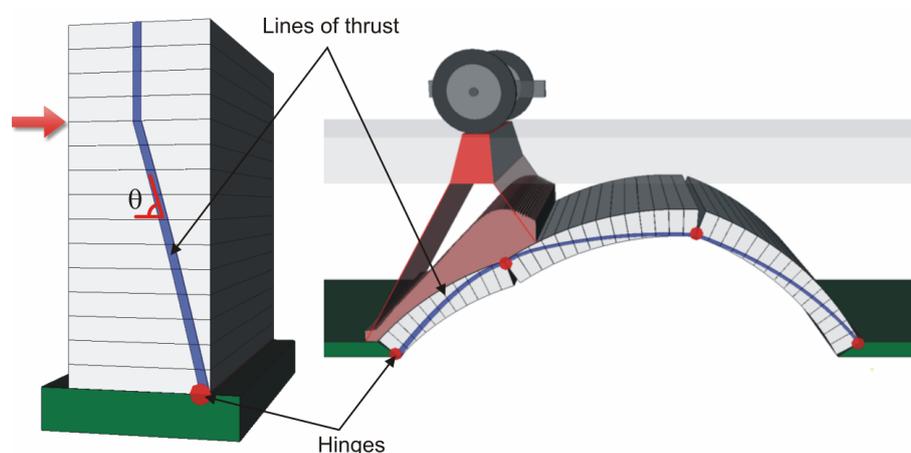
Thrust line at collapse: (a) masonry pier; (b) masonry arch
